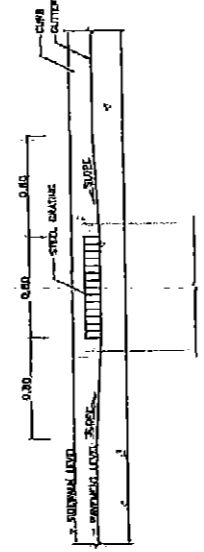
DETAIL OF CURB AND GUTTER OR CURB AT RAISED MEDIAN
